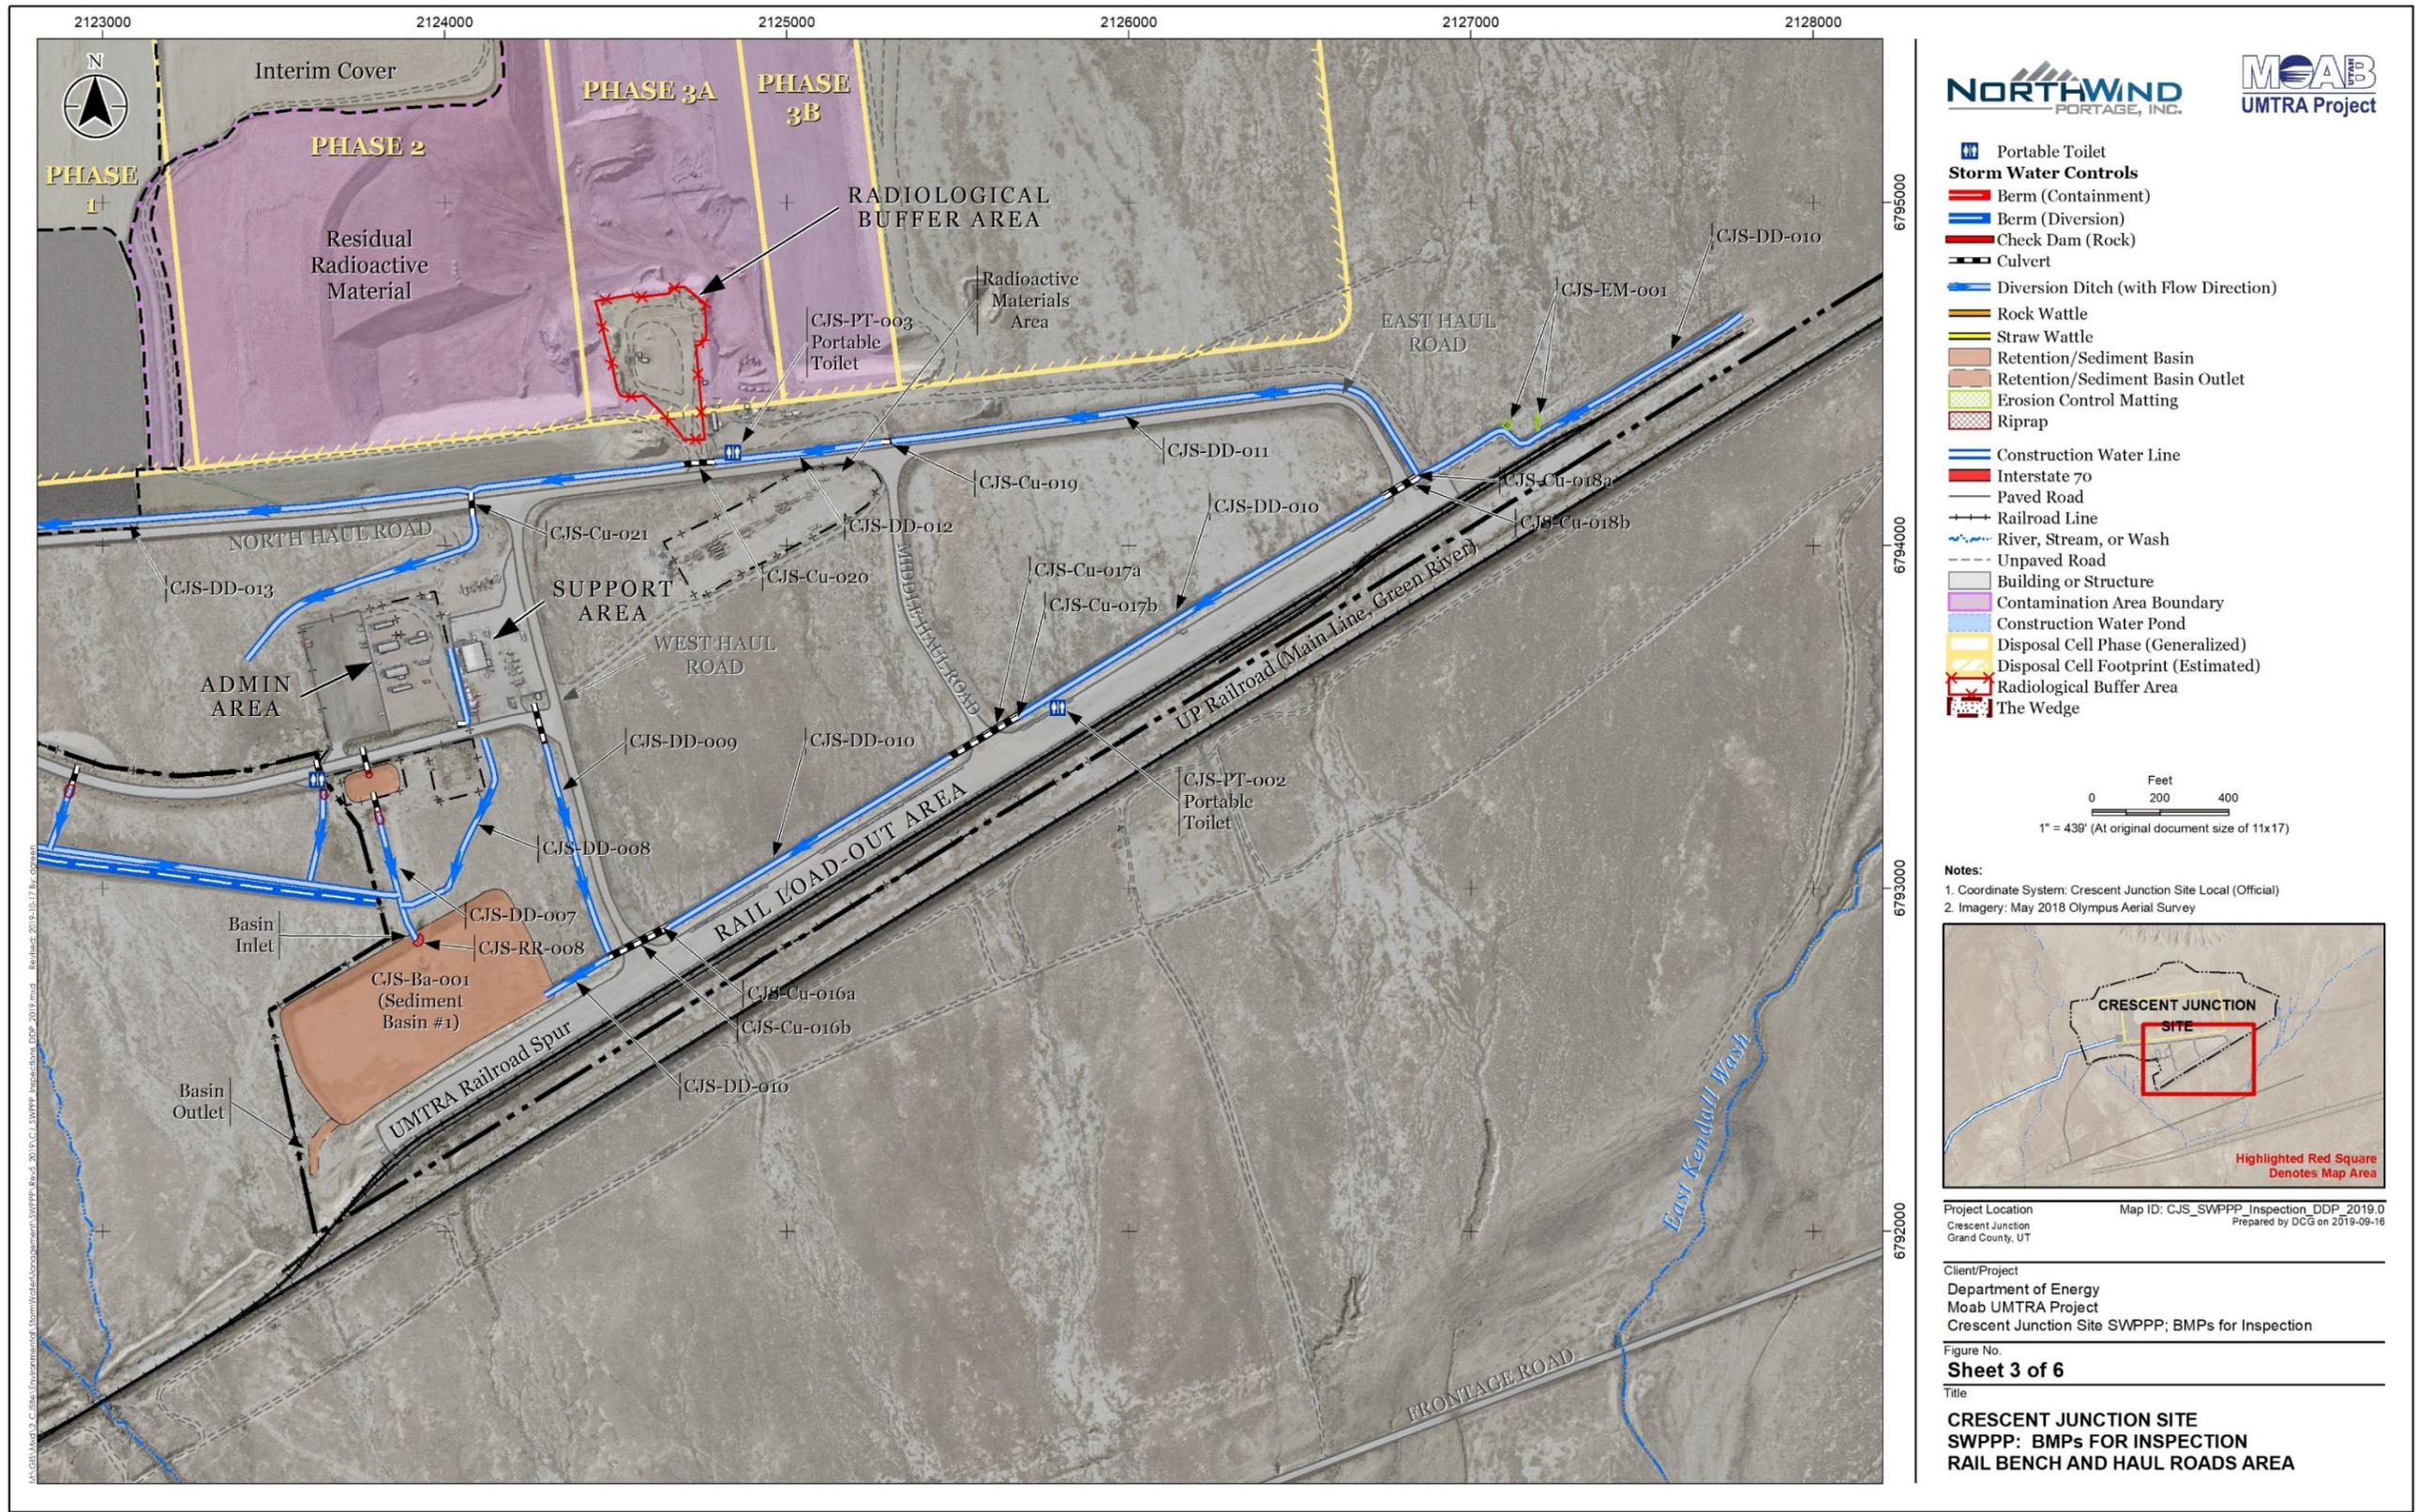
BMPs for Inspection, Rail Bench and Haul Roads Area
